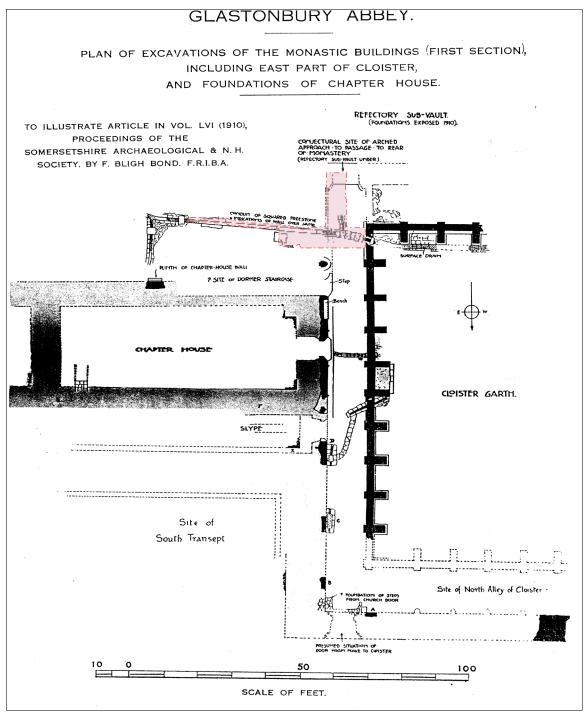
Location of the 2007 trench (marked in pink) in relation to F. Bligh Bond's excavation plan.
